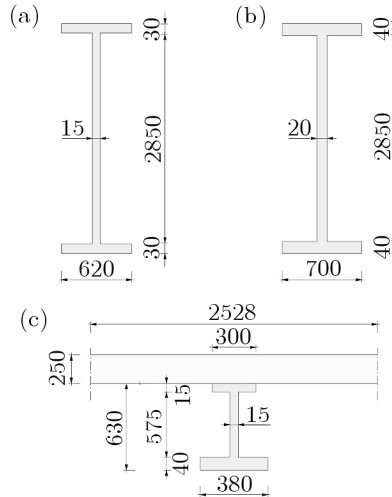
Dimensional details of Zigana bridge: (a) longitudinal lateral double-T steel beams, (b) longitudinal central double-T steel beam, (c) transverse double-T steel beam (lengths in millimeters)
